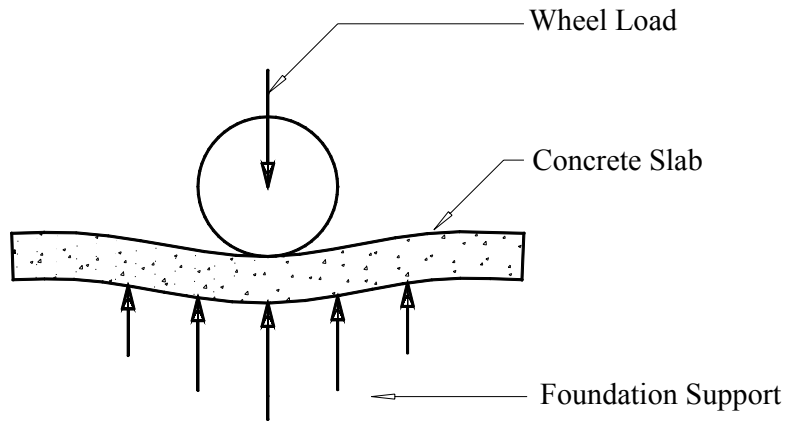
TRANSFER OF WHEEL LOAD TO FOUNDATION IN RIGID PAVEMENT STRUCTURE.
